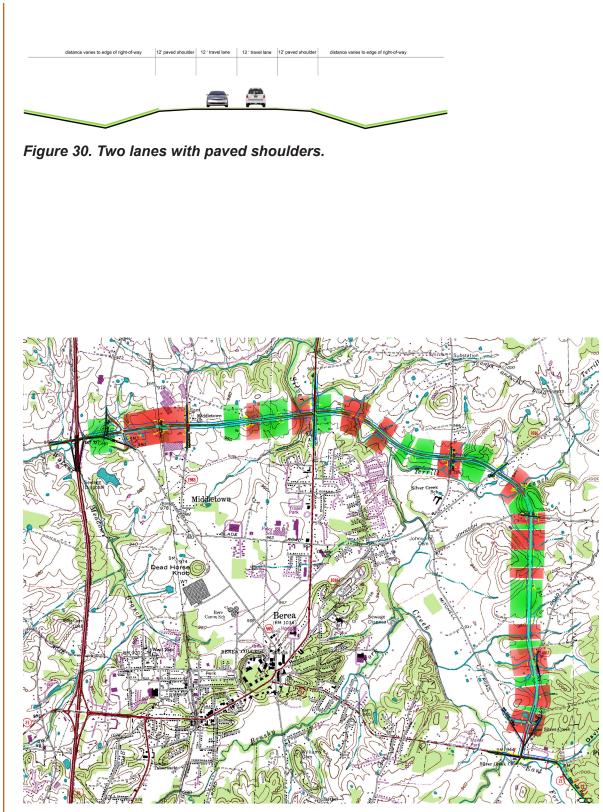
Elevation of the Bypass road relative to surrounding land. Segments in red are elevated, and segments in green are depressed below surrounding grade.
